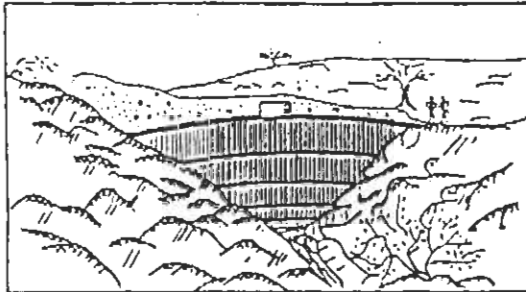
Concrete sand storage dam in Southwest Africa. (Source: O. WIPPLINGER).
